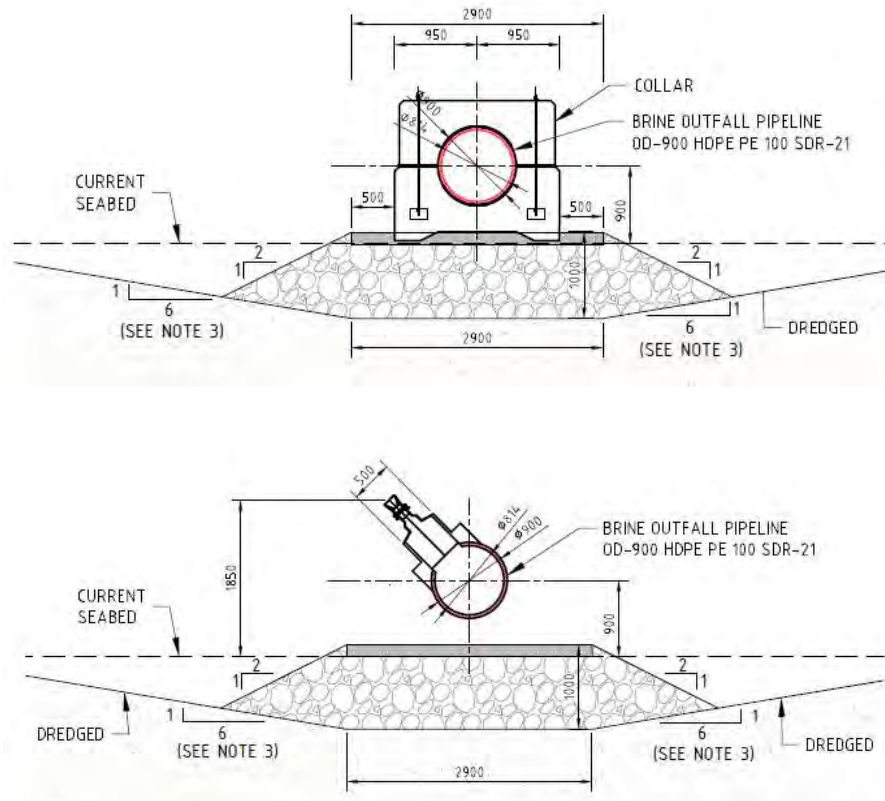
EPDP proposed design geometry for intake and outfall pipelines.
